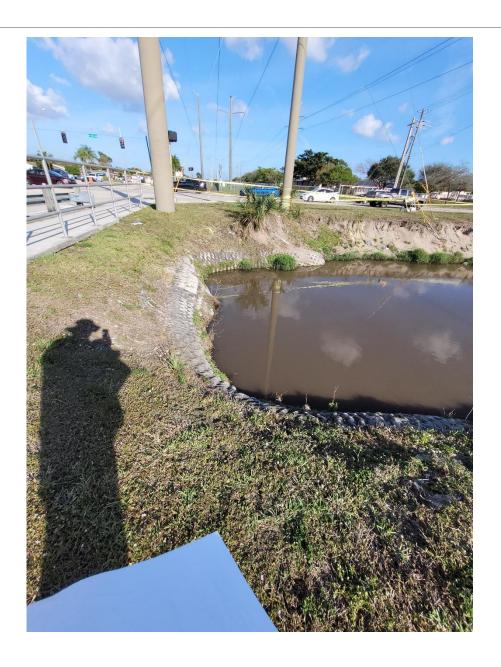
The north end of the NW 72nd Avenue canal at Sheridan Street, looking east. The 96-inch culvert under Sheridan Street is not visible. The photo indicates the additional erosion of the existing eastern canal lake bank.
